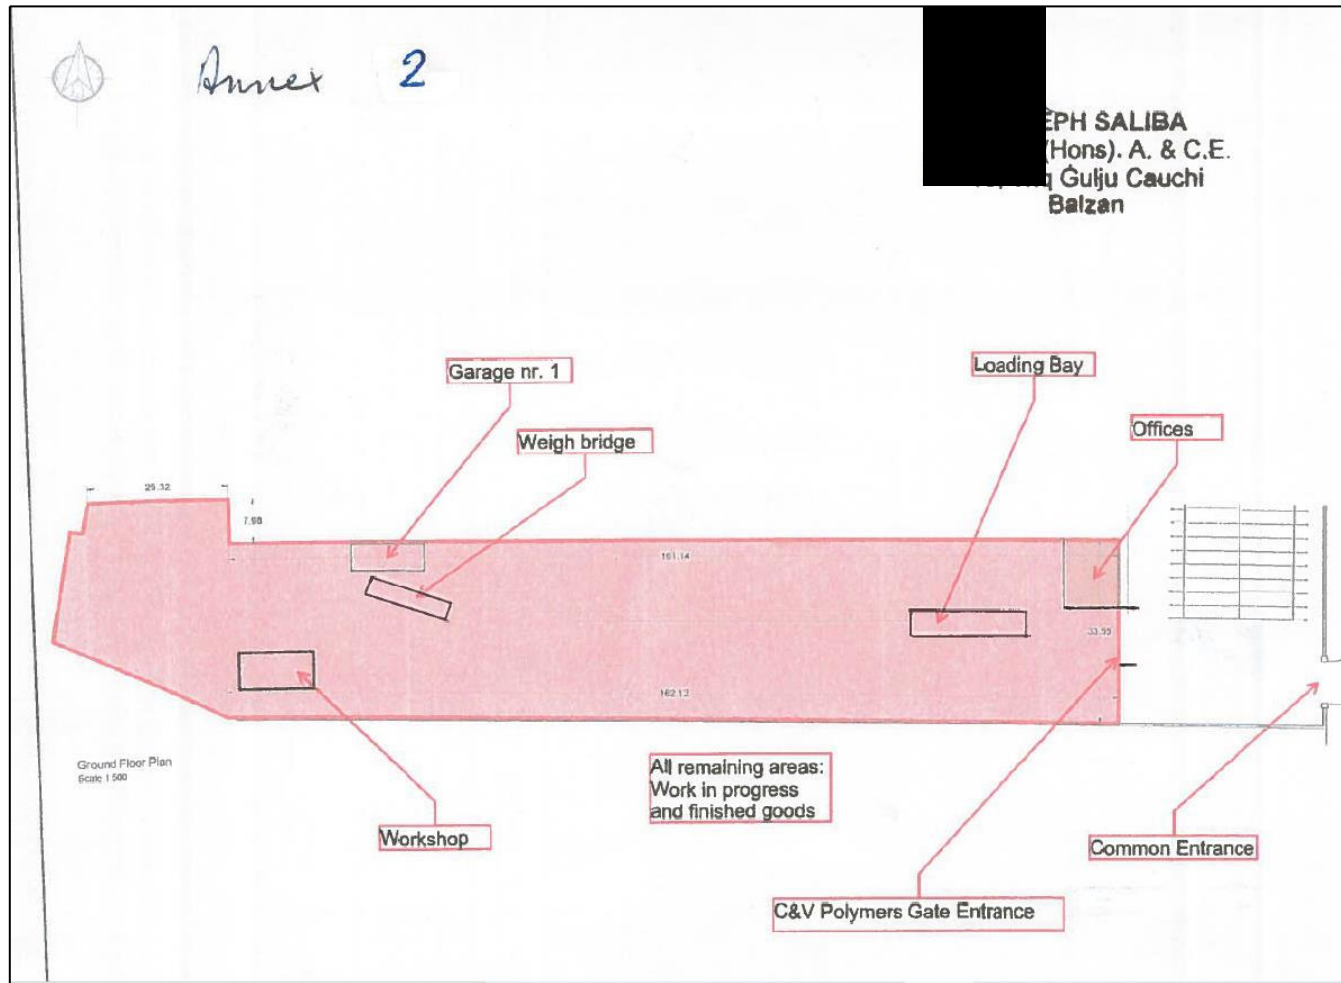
Layout Plan of permitted facility, showing the extent for the carrying out of the activities specified in condition 1.1.1. The extent of the site boundary is indicative and shall not be used for interpretation purposes.
